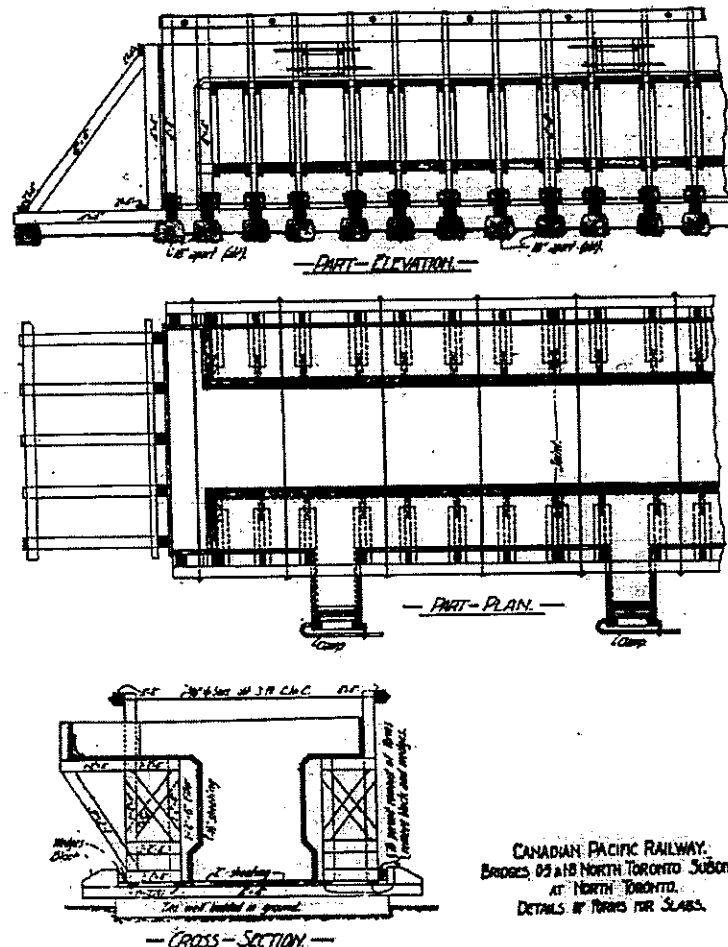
Bridges 9.9 and 1.8, North Toronto Subdivision, C.P.R. Details of forms for slabs.
